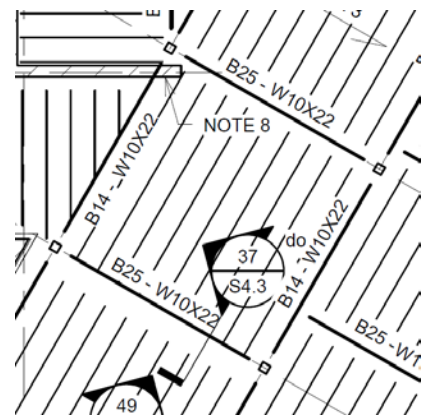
Typical central core bay of 12' 8" x 13' 4" (Plans S1.3A)
